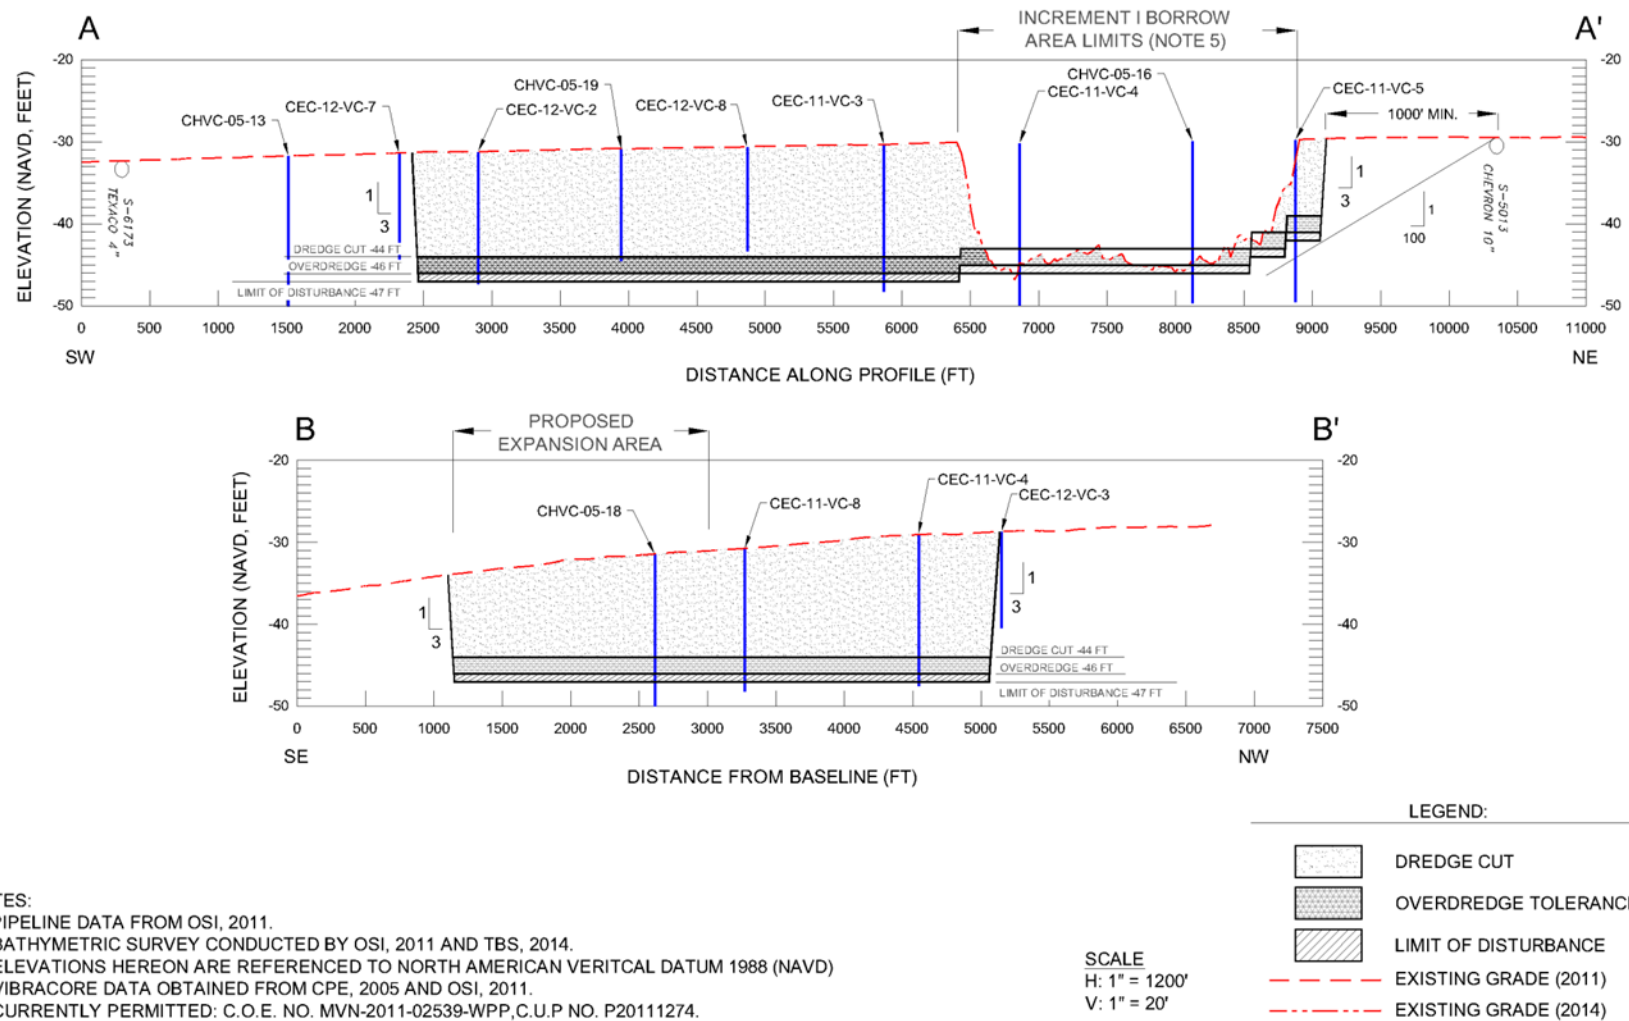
South Pelto Blocks 13 and 14 Borrow Area Cross Sections - Expansion
